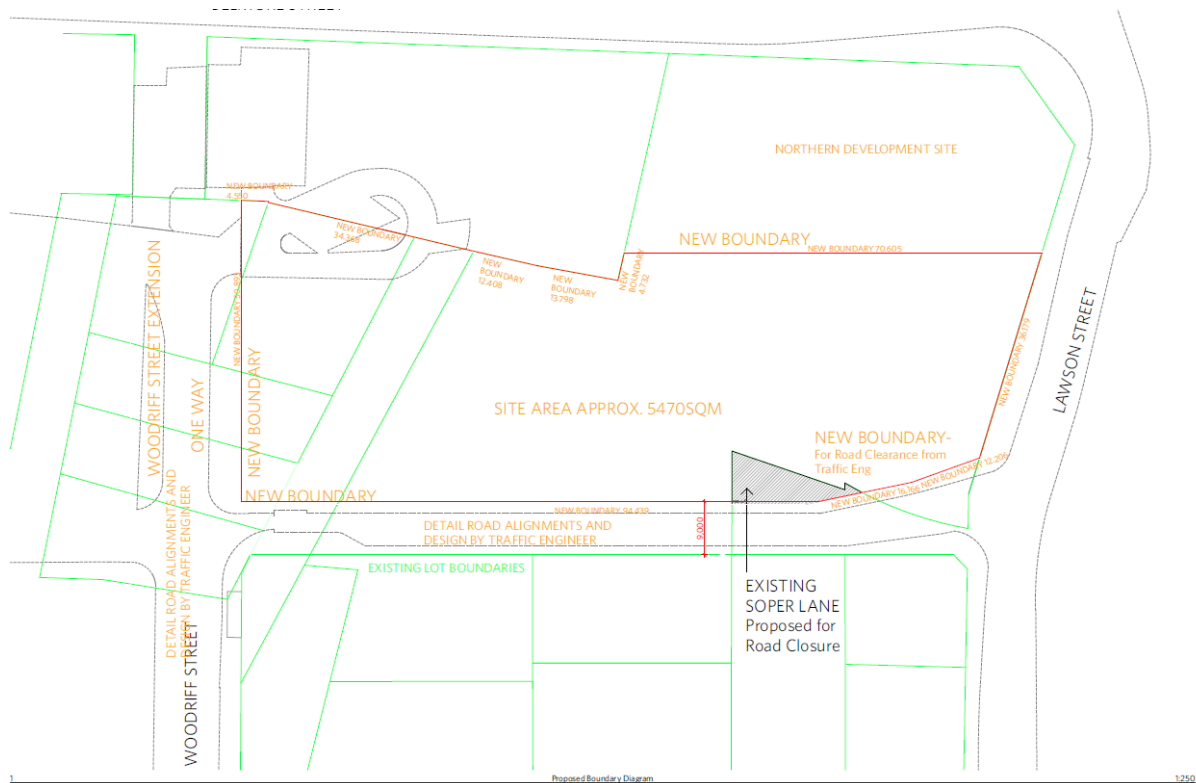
Extract of boundary realignment plan (Source: DBJ, Applicant Architect)
